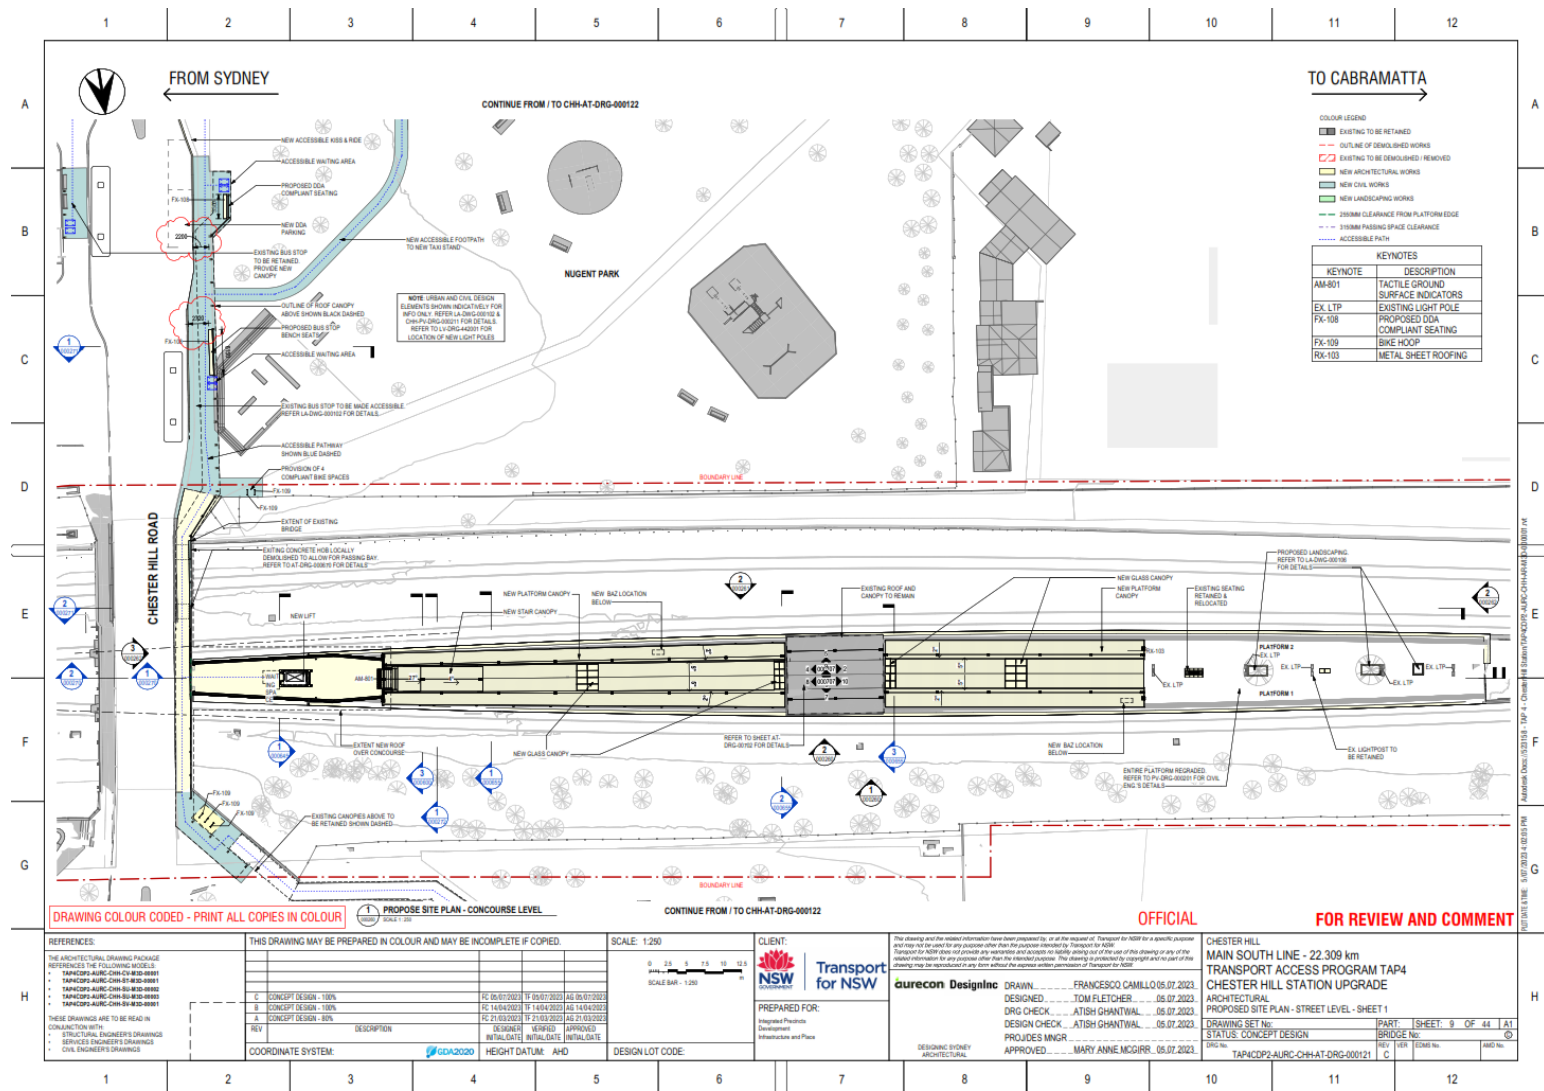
Proposed site plan for Chester Hill Station (Source: Aurecon 2024)
